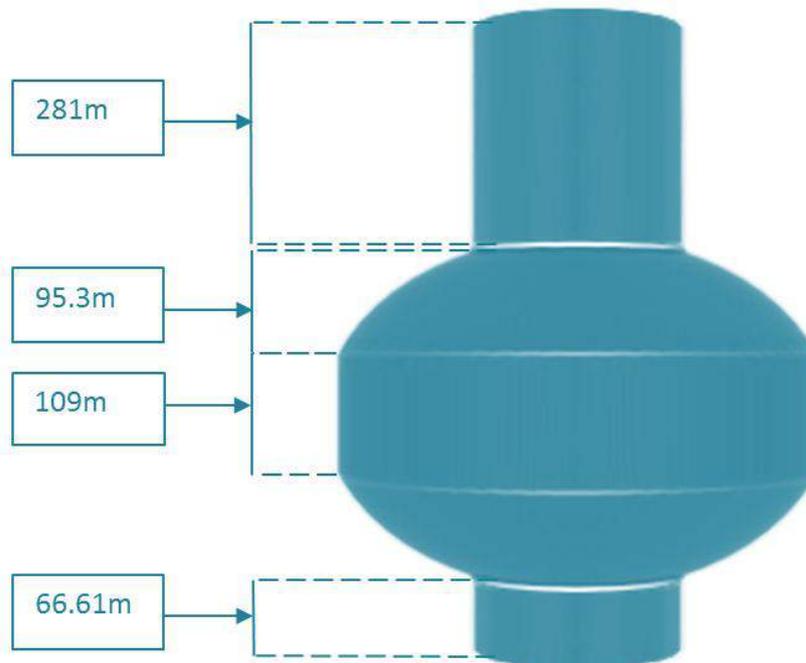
Structural parameters of Floor of Recreation Centre
